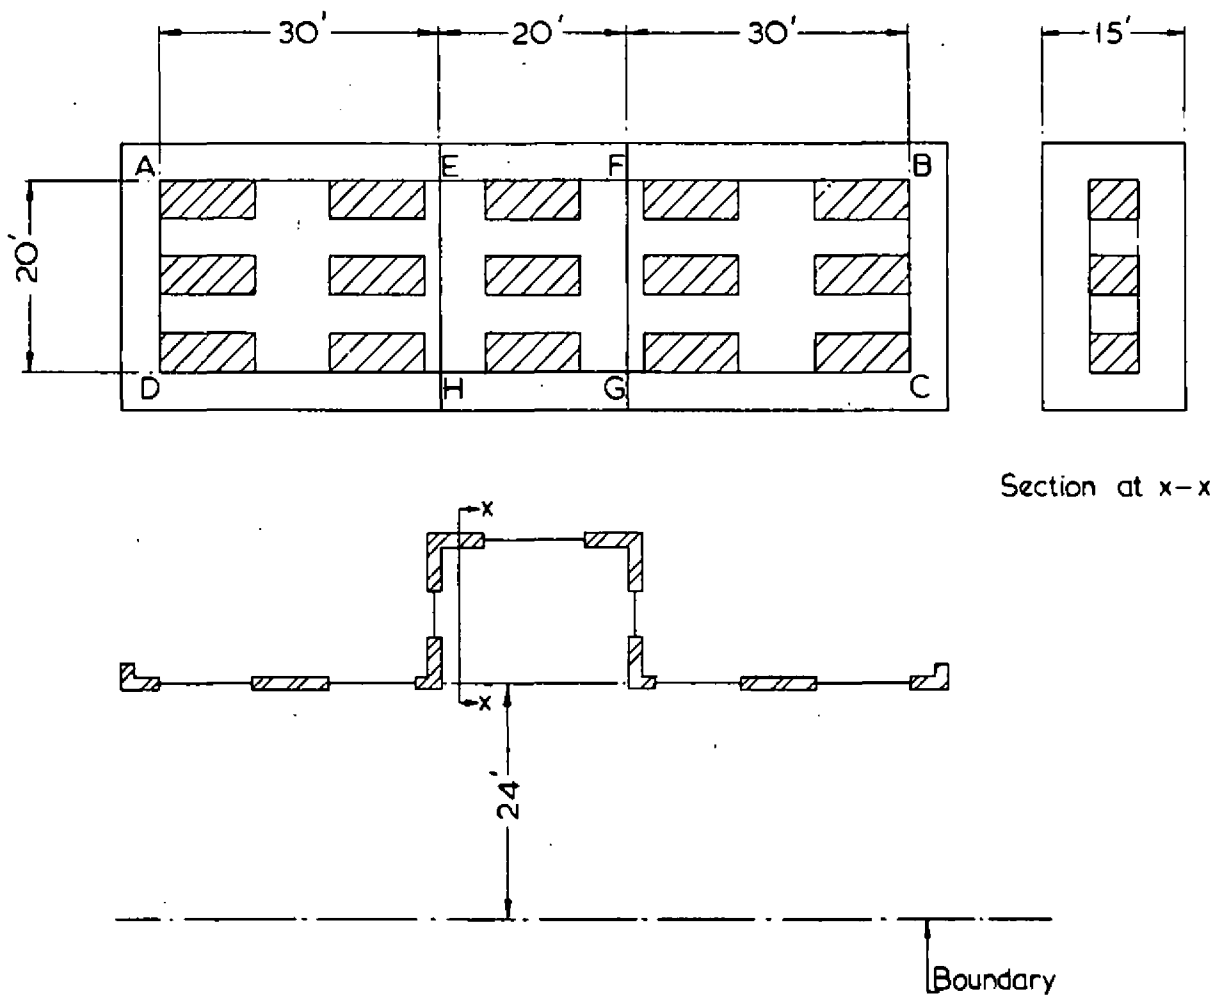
RECESSED ELEVATION: OPENINGS IN ALL SIDES
